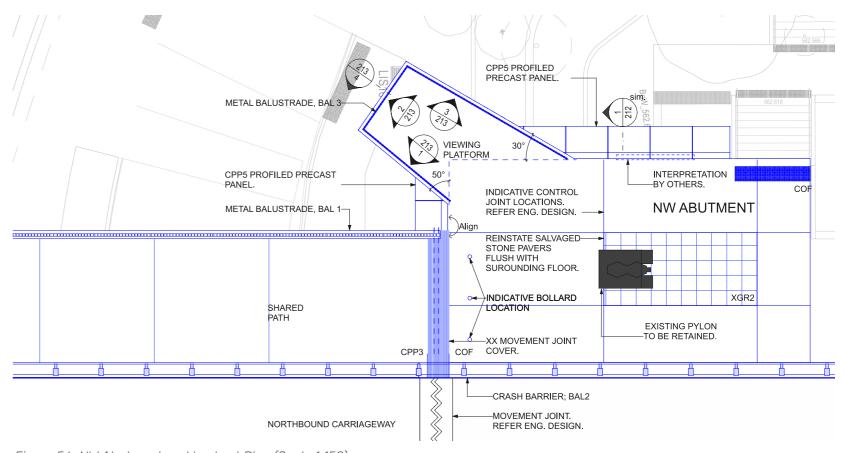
NW Abutment and Lookout Plan (Scale 1:150)
